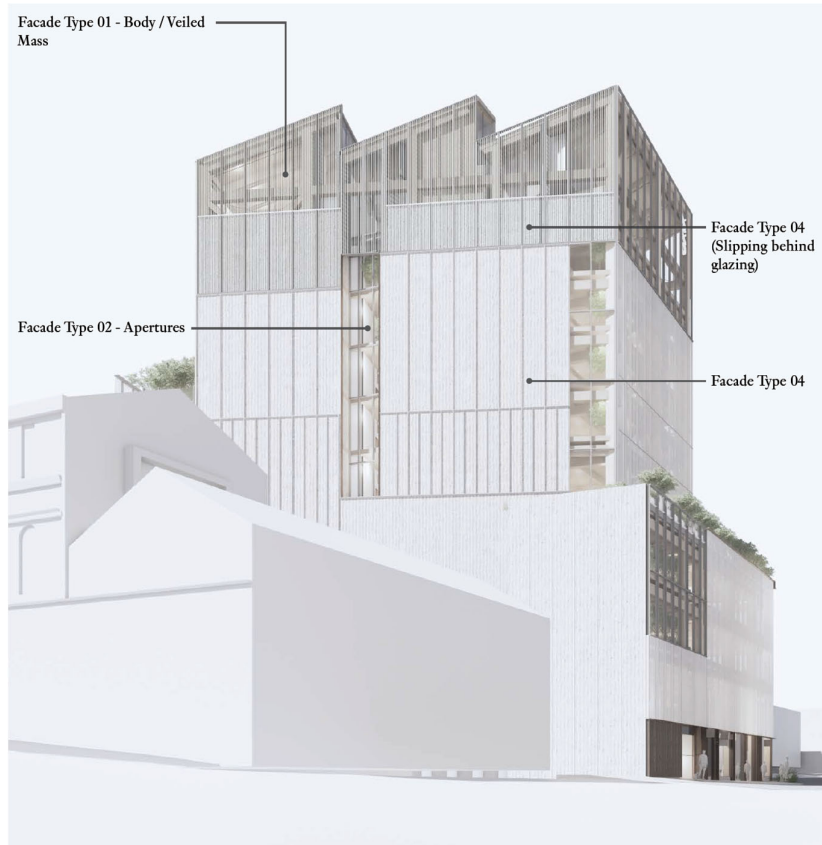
Image C: Render of building illustrating the exterior façade treatment to the west and south (source: Fearon Hay Ltd).
